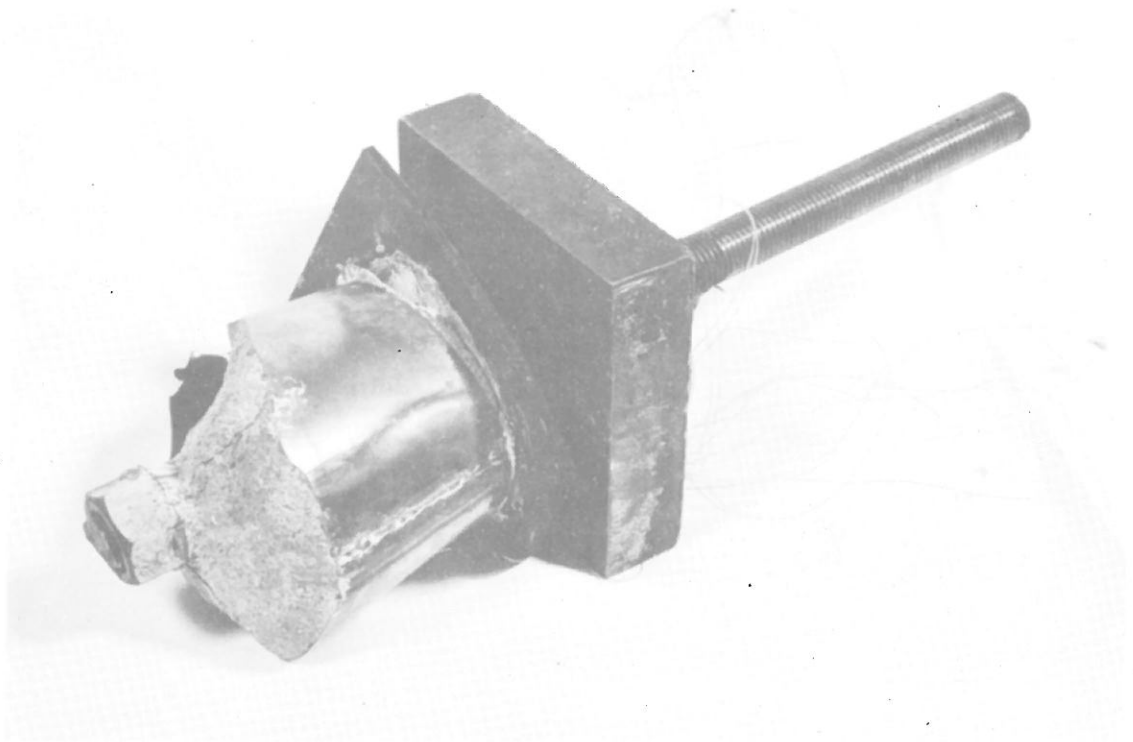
Anchor bolt SC 1:4 after failure. Detail of concrete above washer
